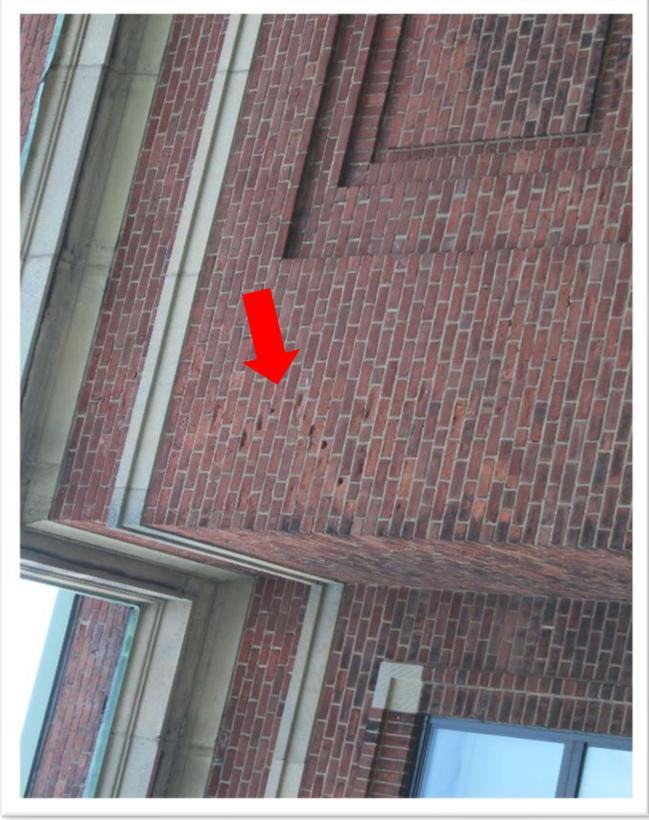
One of several locations of spalling brick observed along the building's south elevation.
